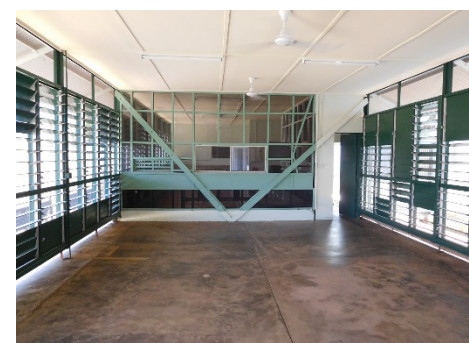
Interior of the mess (dining room) looking towards the kitchen. Note openings to the top and bottom of the external window walls.
